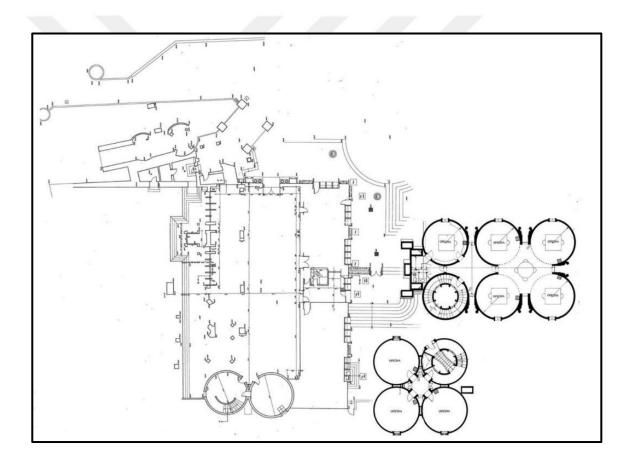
Floor plan of The Factory, Ricardo Bofill, 1975 [200]
